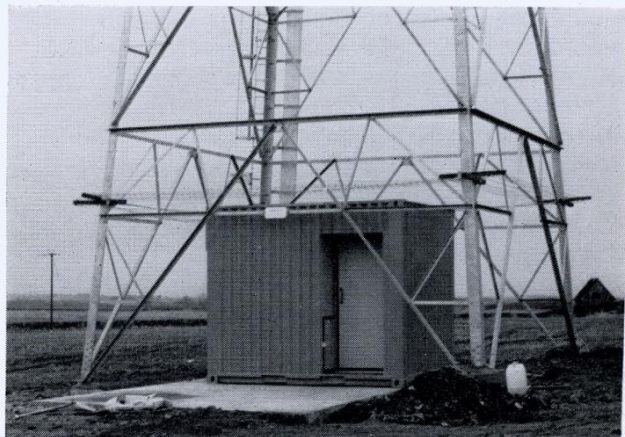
The IBA steel 'container' building in position within the base of the aerial tower. Four 10-watt all-solid-state transposer-transmitters and all ancillary equipment can be housed within the building.
